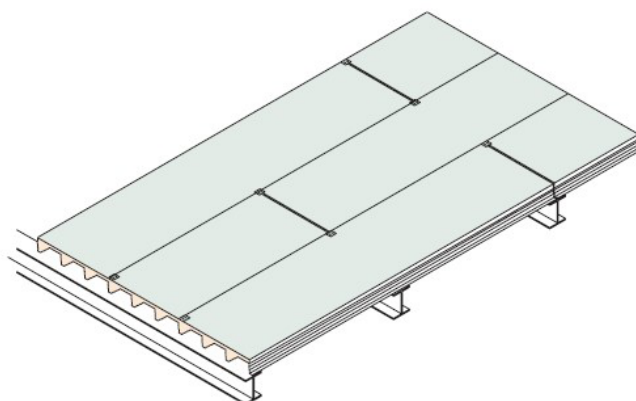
Kingspand recommended application: triple support and half brick bond for equal load distribution
